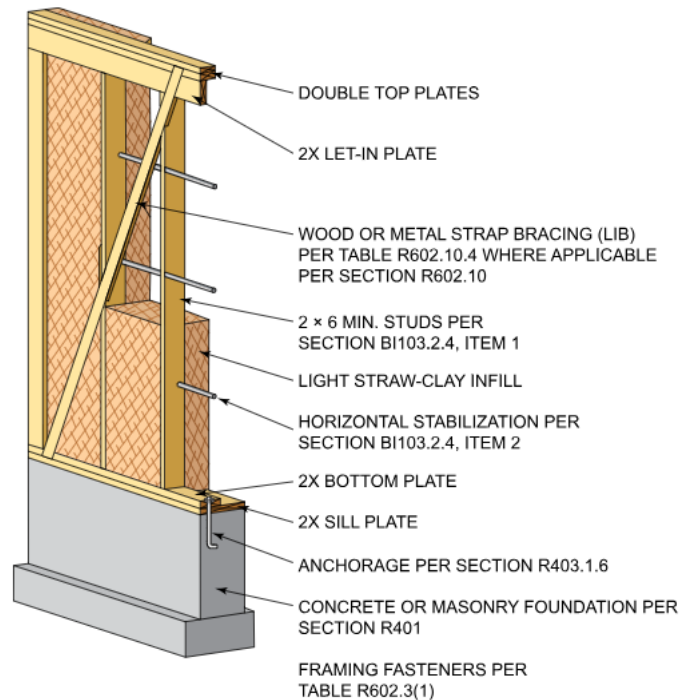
(3) LIGHT STRAW-CLAY WALL WITH BLIND STUDS
